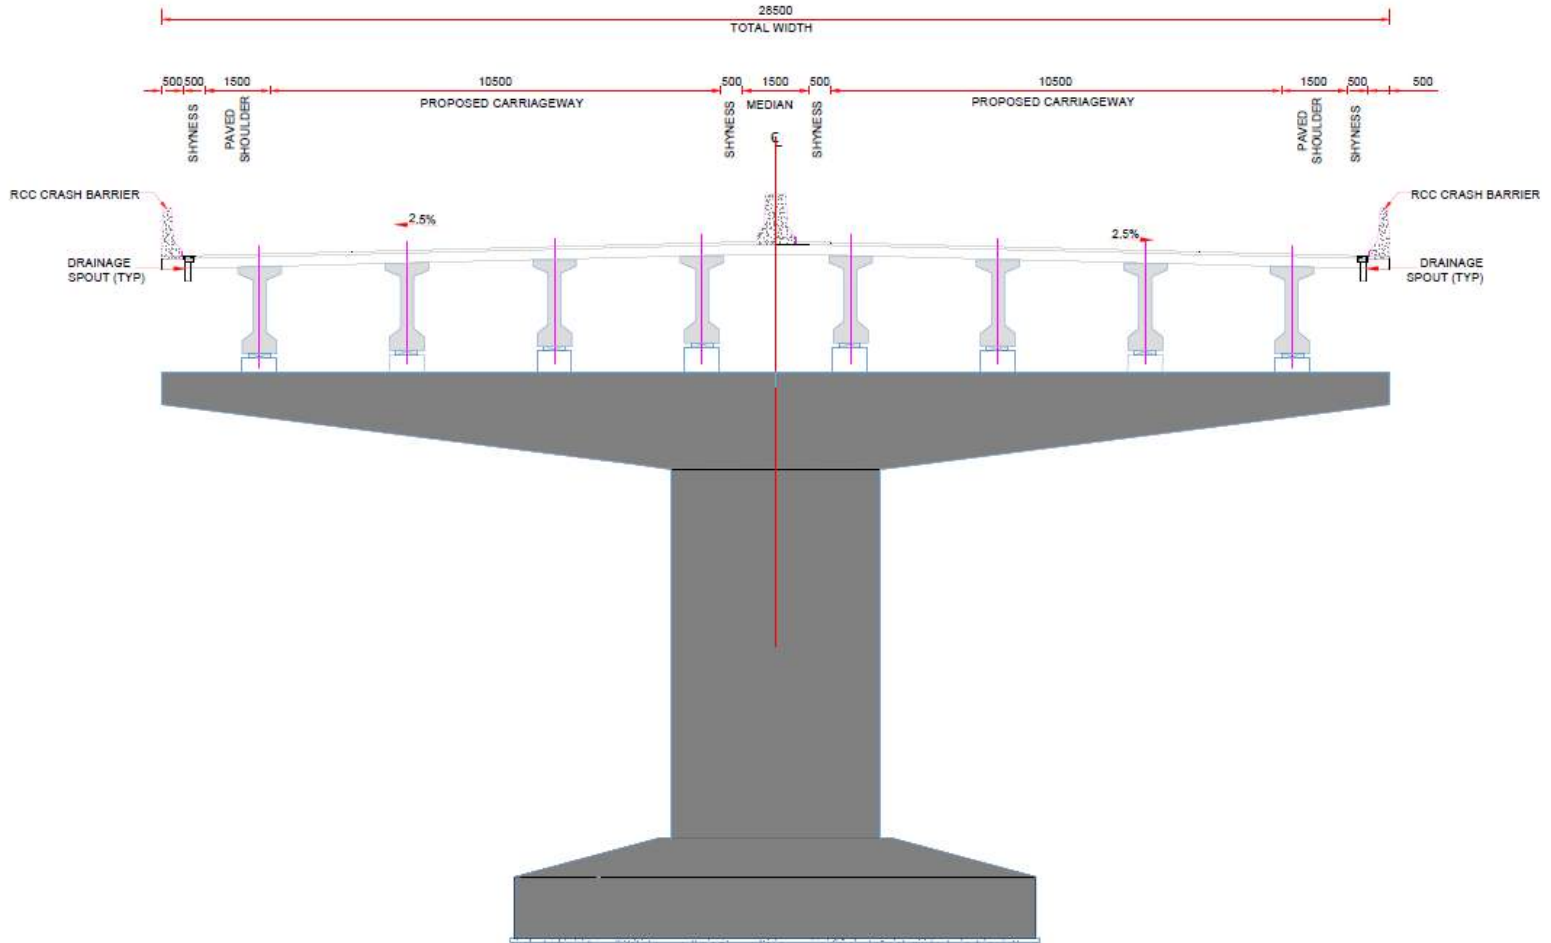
Proposed Elevated Rotary at Swami Vivekananda Metro Station On Old Madras Road
